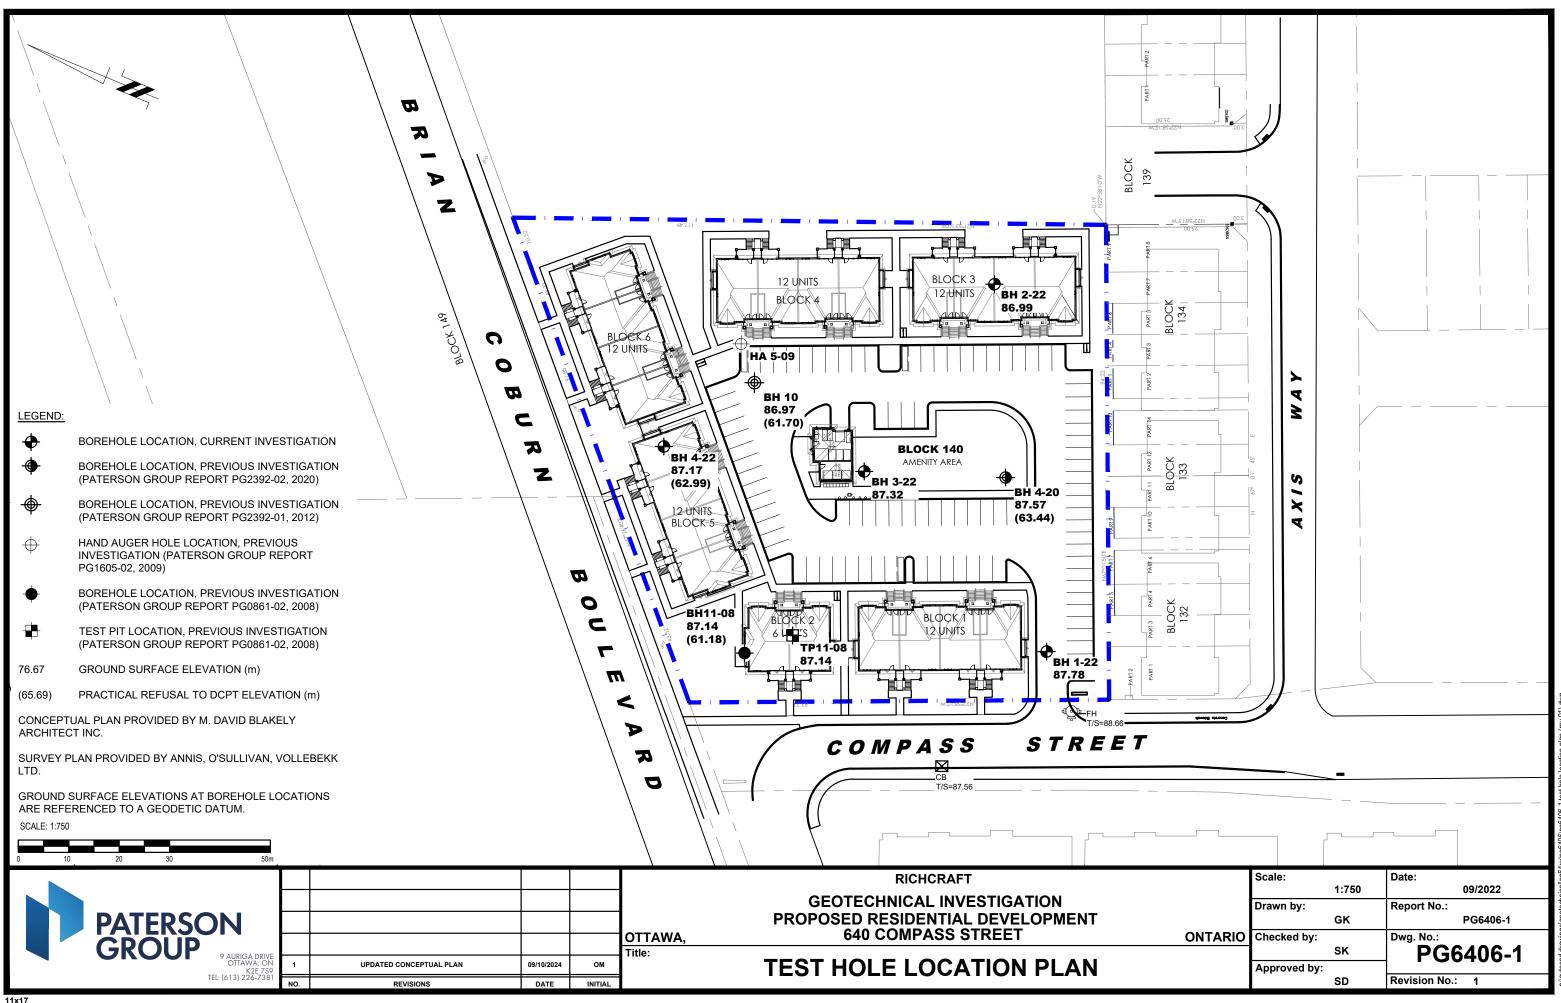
KEY PLAN DRAWING PG6406-1 – TEST HOLE LOCATION PLAN DRAWING PG6406-2 – PERMISSIBLE GRADE RAISE PLAN
